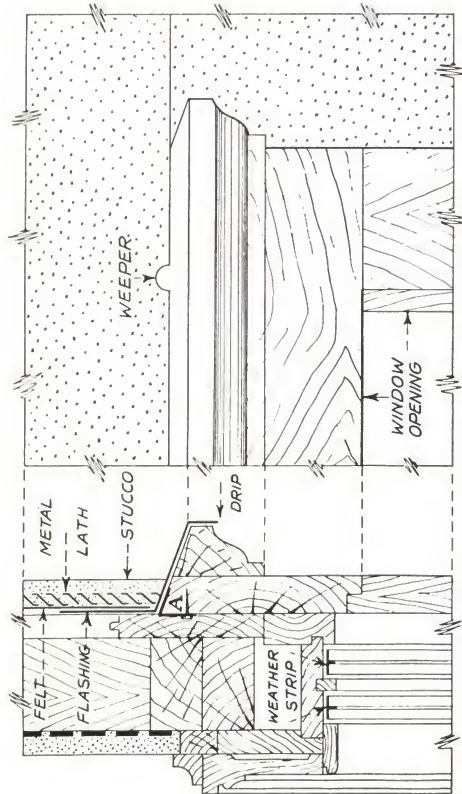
FLASHING WINDOW HEAD ON METAL LATH AND STUCCO WALL - SCALE 1 1/2" = 1'-0"
